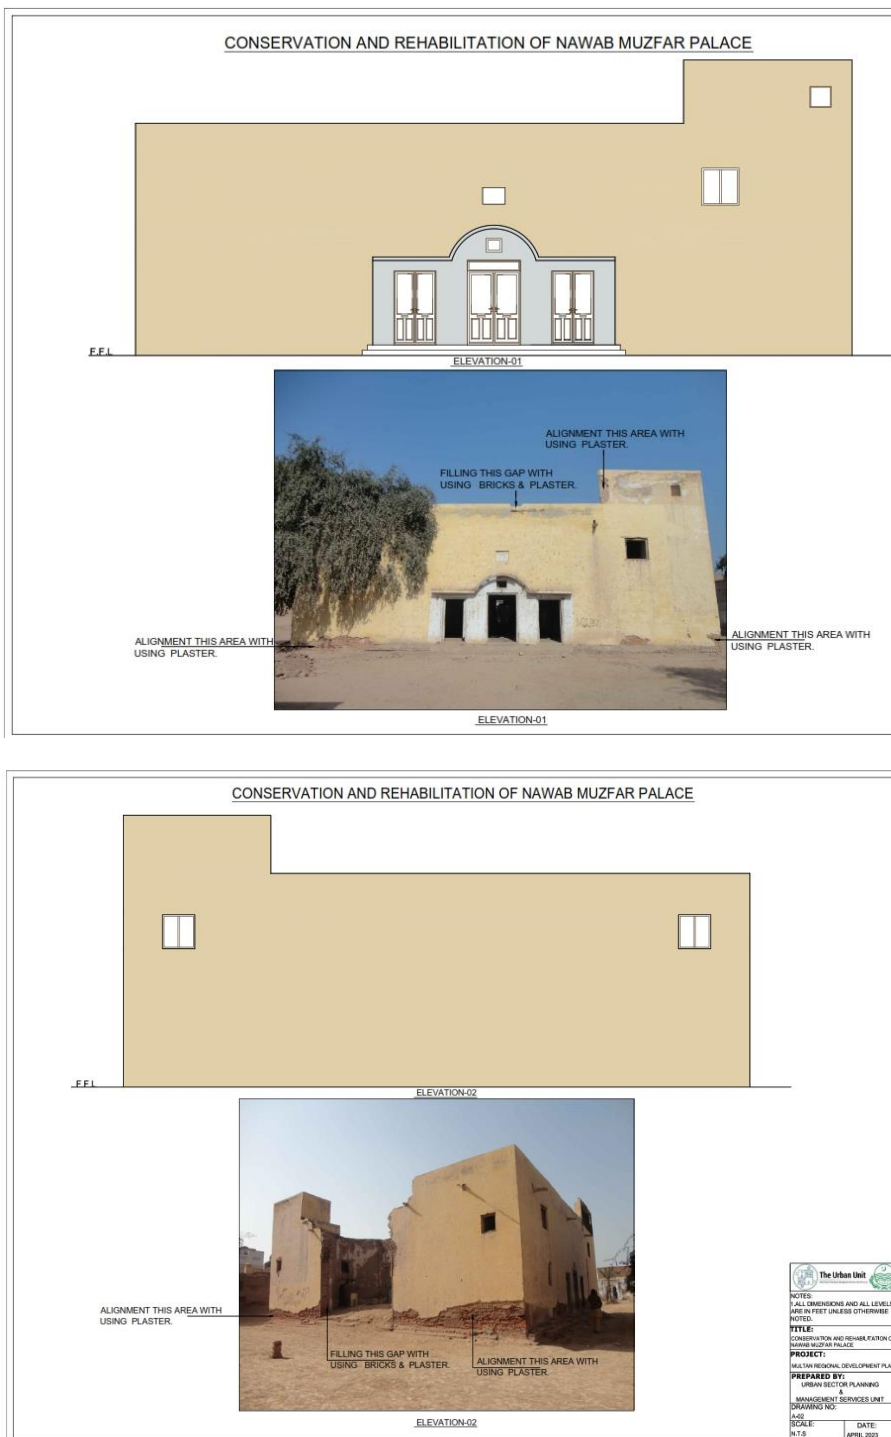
Proposed Conservation Plan of Muzaffar Khan Palace
